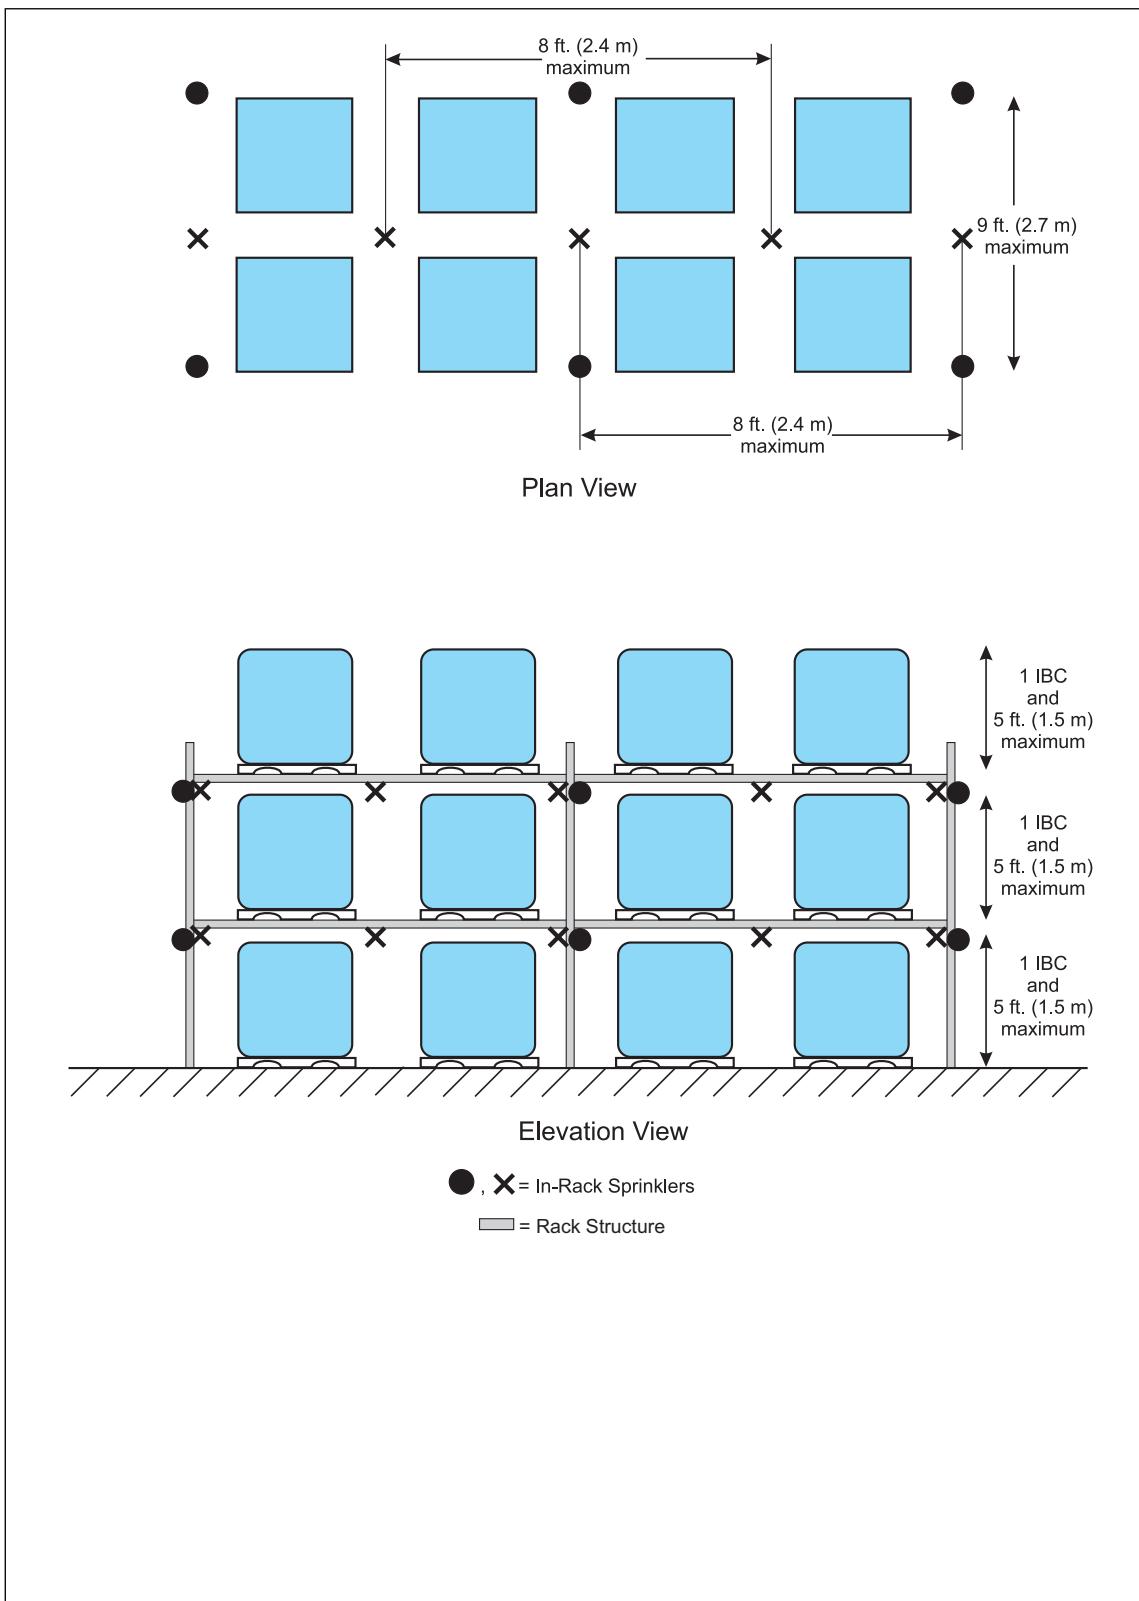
Double-row rack sprinkler layout: IBC protection scheme
